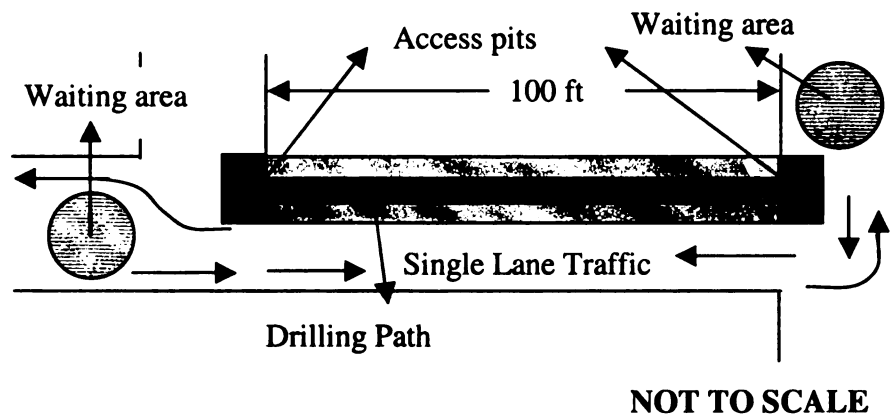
Site Layout for the Alternate Method of Installation, UFL
